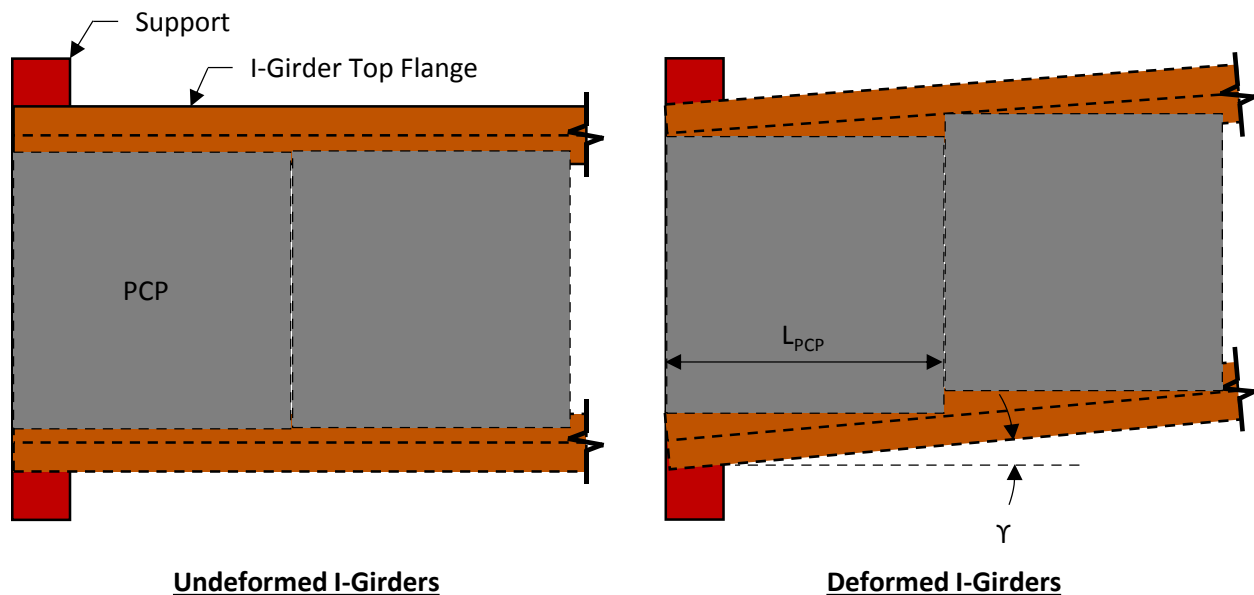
I-Girder Deformation near the Supports – Plan View
